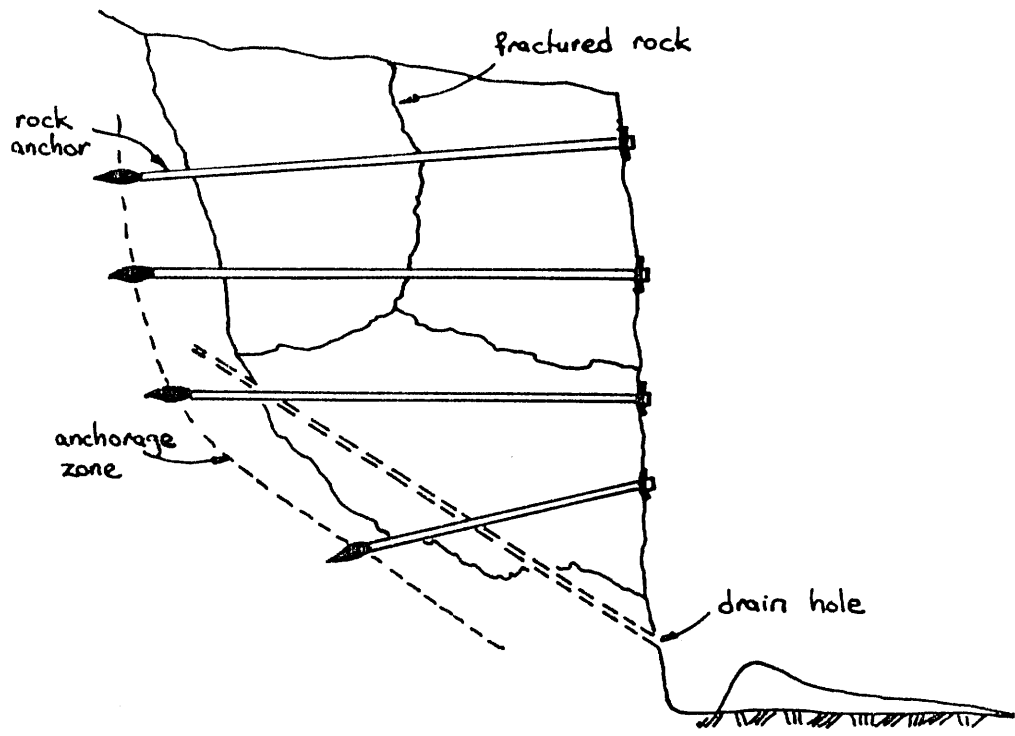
TYPICAL SLOPE ANCHOR INSTALLATION.
